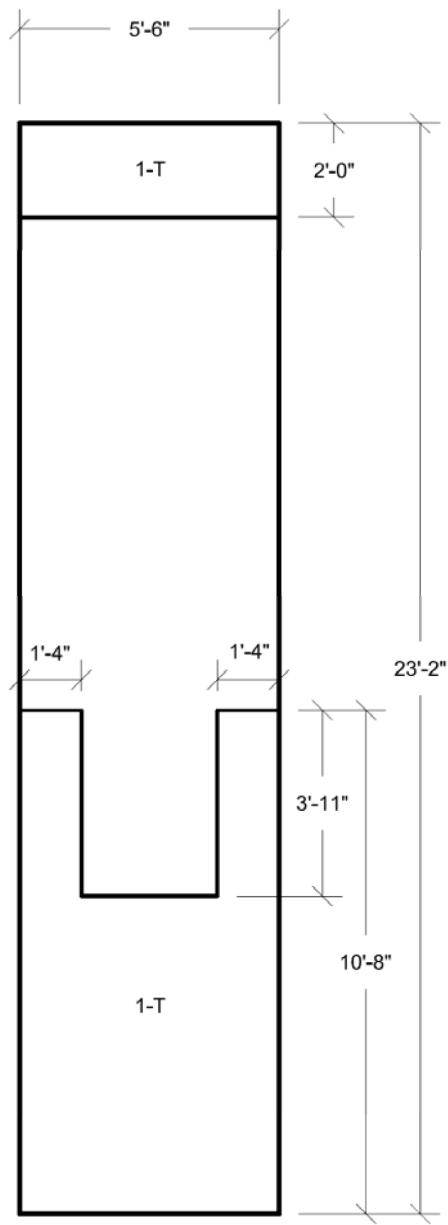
H.7-10 Access Region Walls Looking From Outside Vertical Reinforcement Zones Near Side and Far Side Faces
